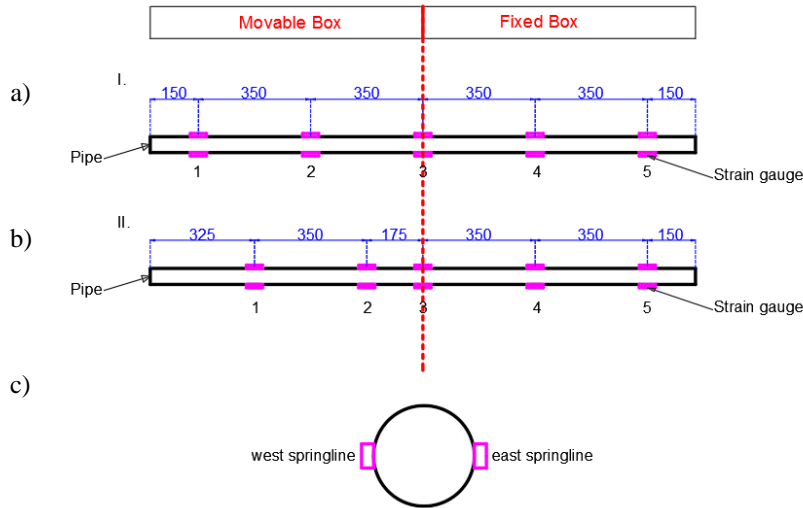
a) Strain gauge layout I, b) strain gauge layout II, and c) pipe spring-lines (dimensions in mm)
